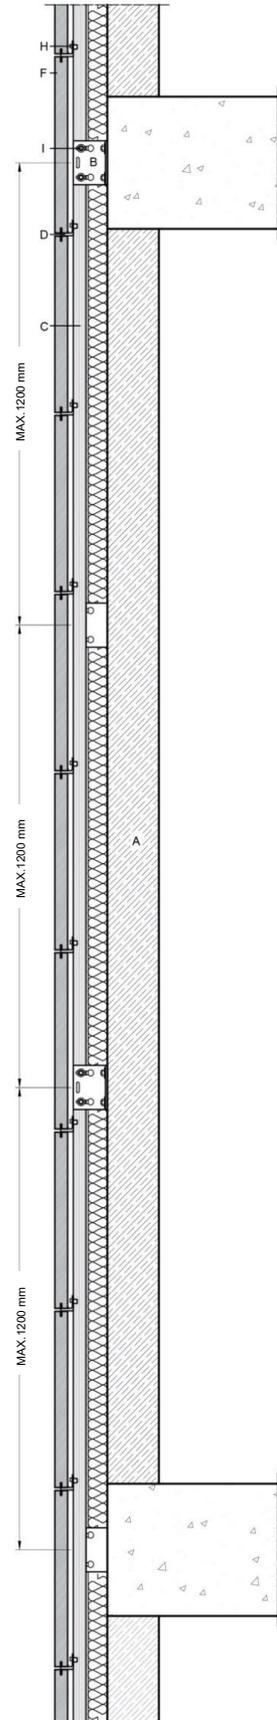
DETAIL OF PROFILES HORIZONTAL AND VERTICAL JOINTS
